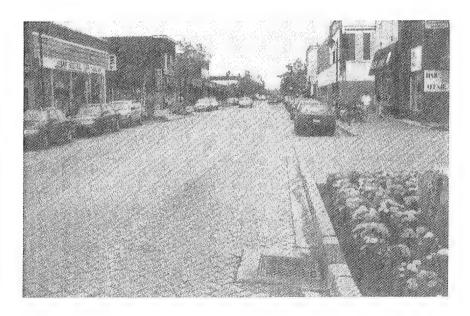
Precast concrete paving blocks on streets and sidewalks in North Bay, Ontario (from Smith 1993)
